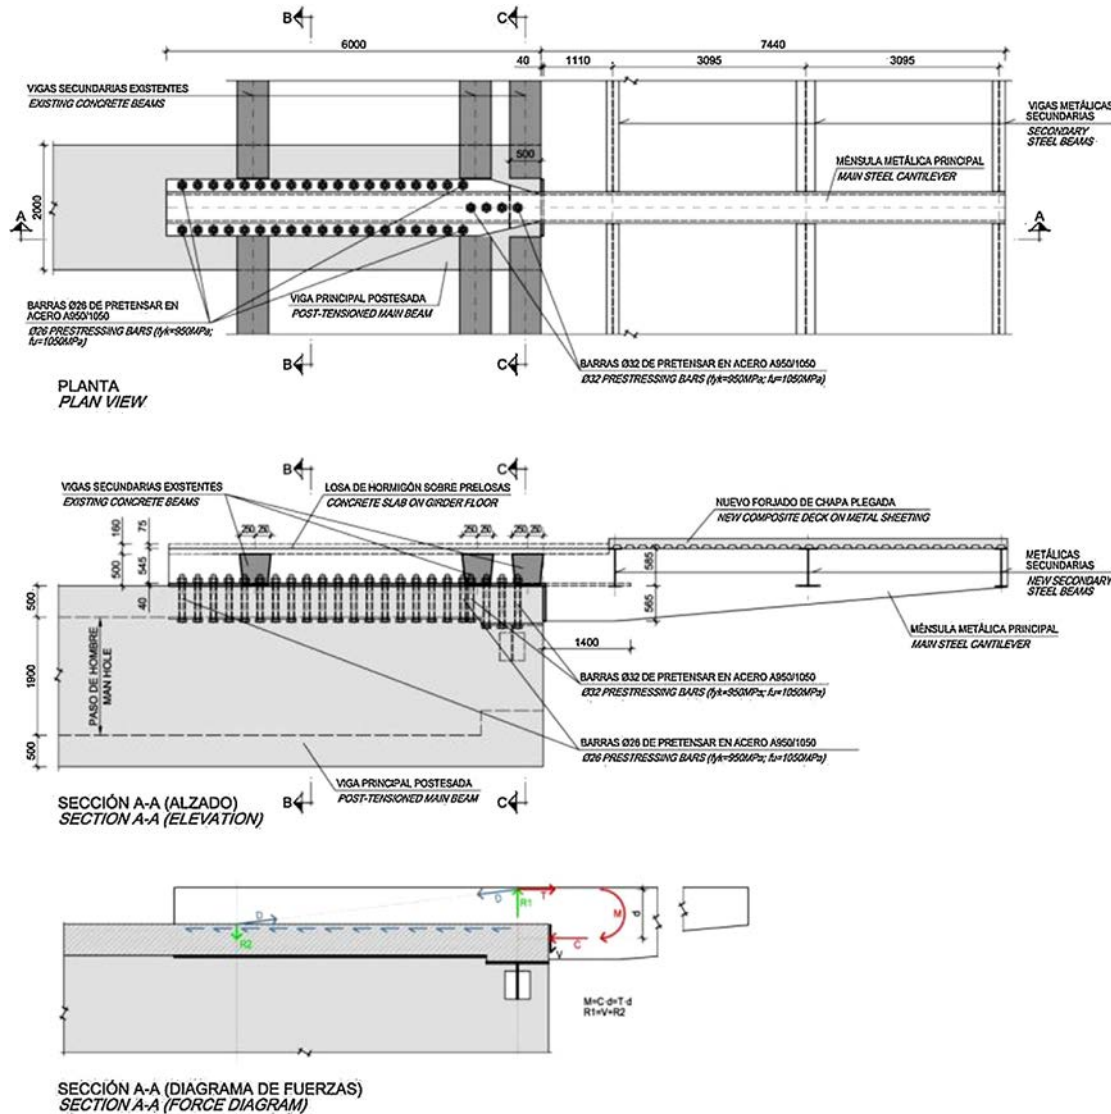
Cantilevered by-pass (plan and elevation). Cross-sections B-B and C-C in Figure 27.
